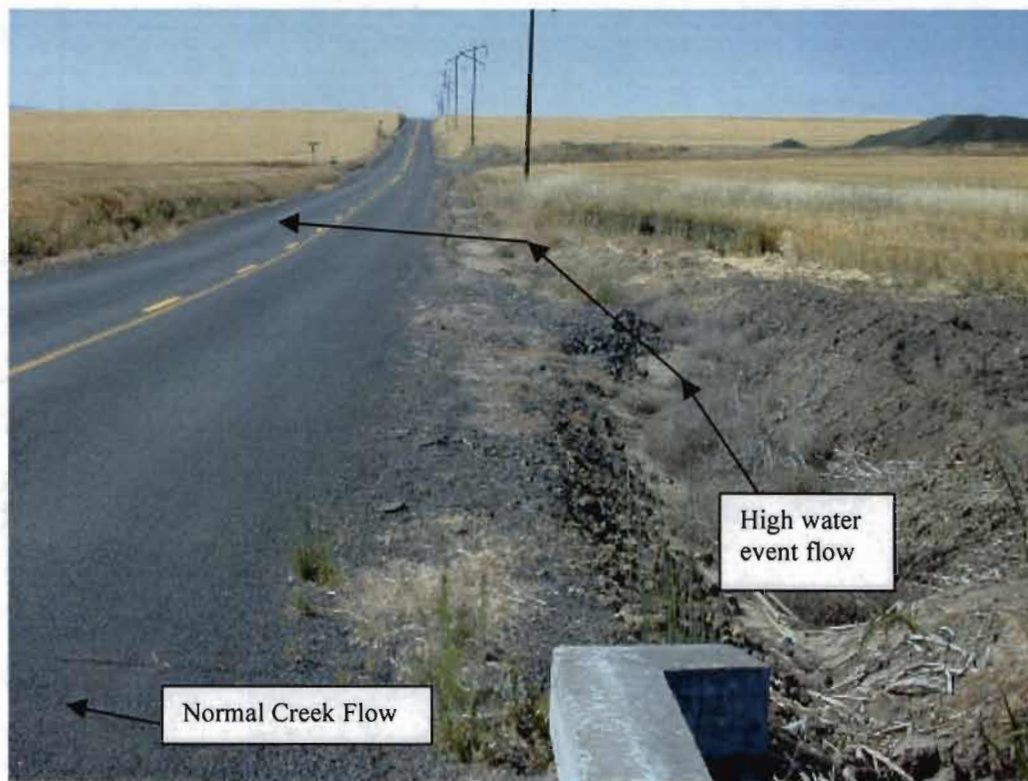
View looks south from Greasewood Creek crossing south of Helix.
